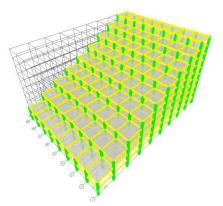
A 3-D View of 9<sup>th</sup> storeys Rectangular shaped setback building.
